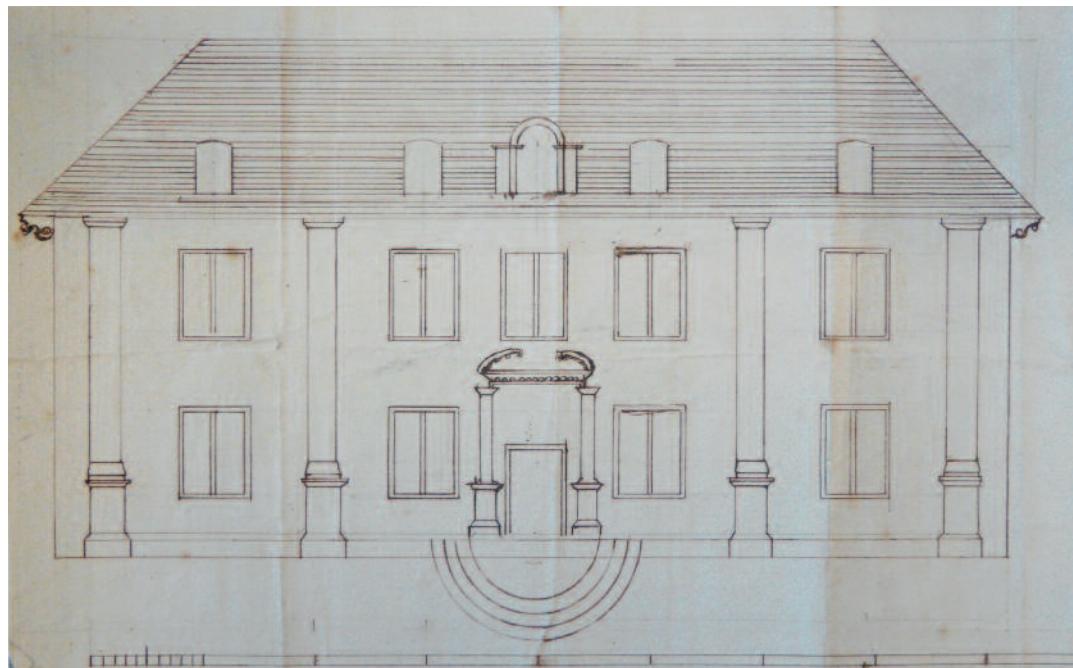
Capheaton Hall: south elevation, complementary to the plan illustrated at Fig. 6
